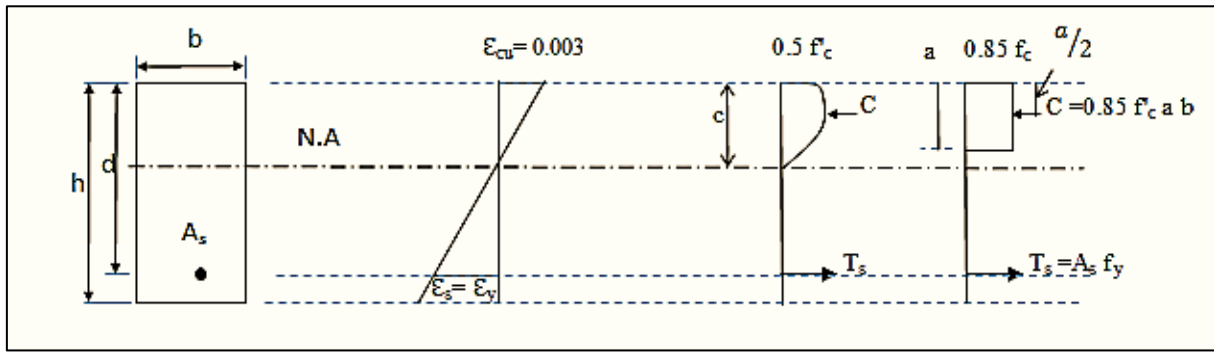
Stress and Strain in Rectangular Cross-Section Beam with Conventional Concrete
